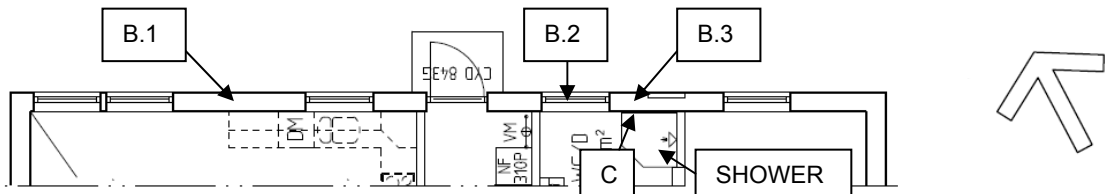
Location of measured places and positions, B.1, B.2, B.3 and C in the North-North West wall.
